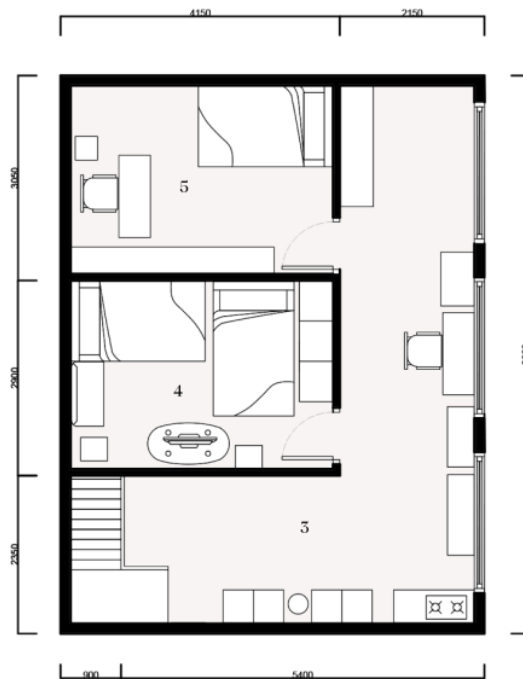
G5 - 2nd floor layout plan, scale 1:100
